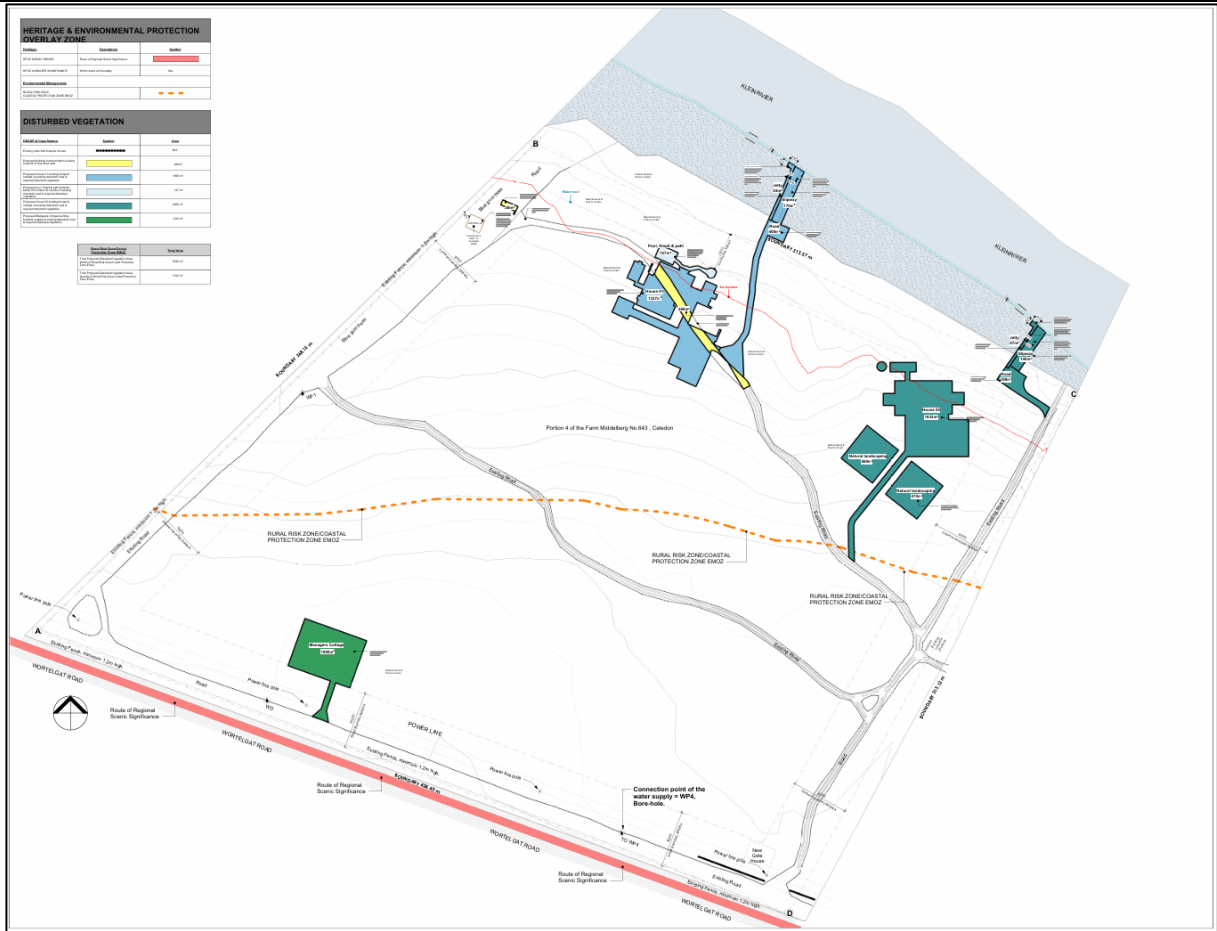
1: Alternative 1 (non-preferred) site development plan.
